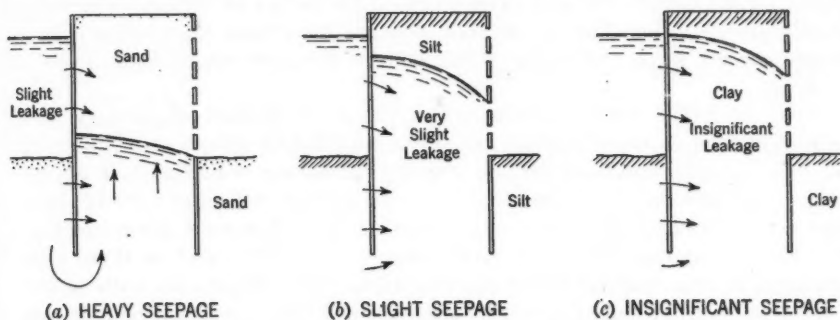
CELLULAR COFFERDAMS ON A SOIL FOUNDATION
